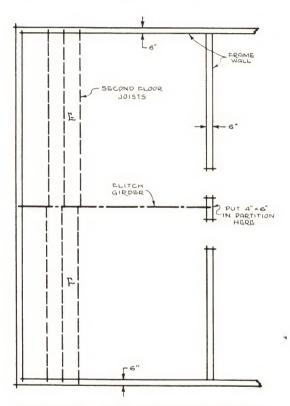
Remodeled Part of First Floor Showing How a Flitch Girder Might Be Used to Support Second-Floor Joists
